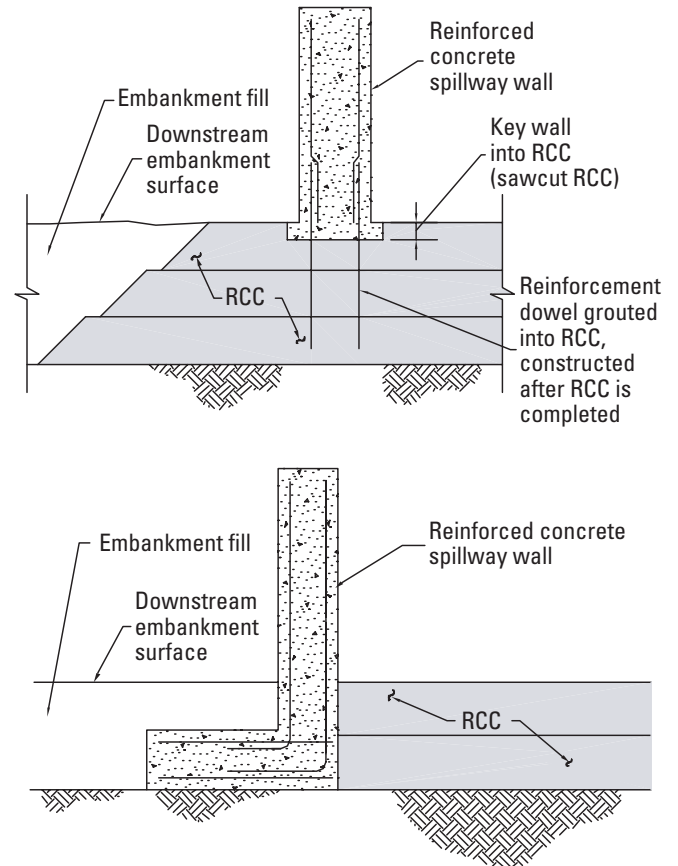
Reinforced concrete training walls (section looking downstream).
